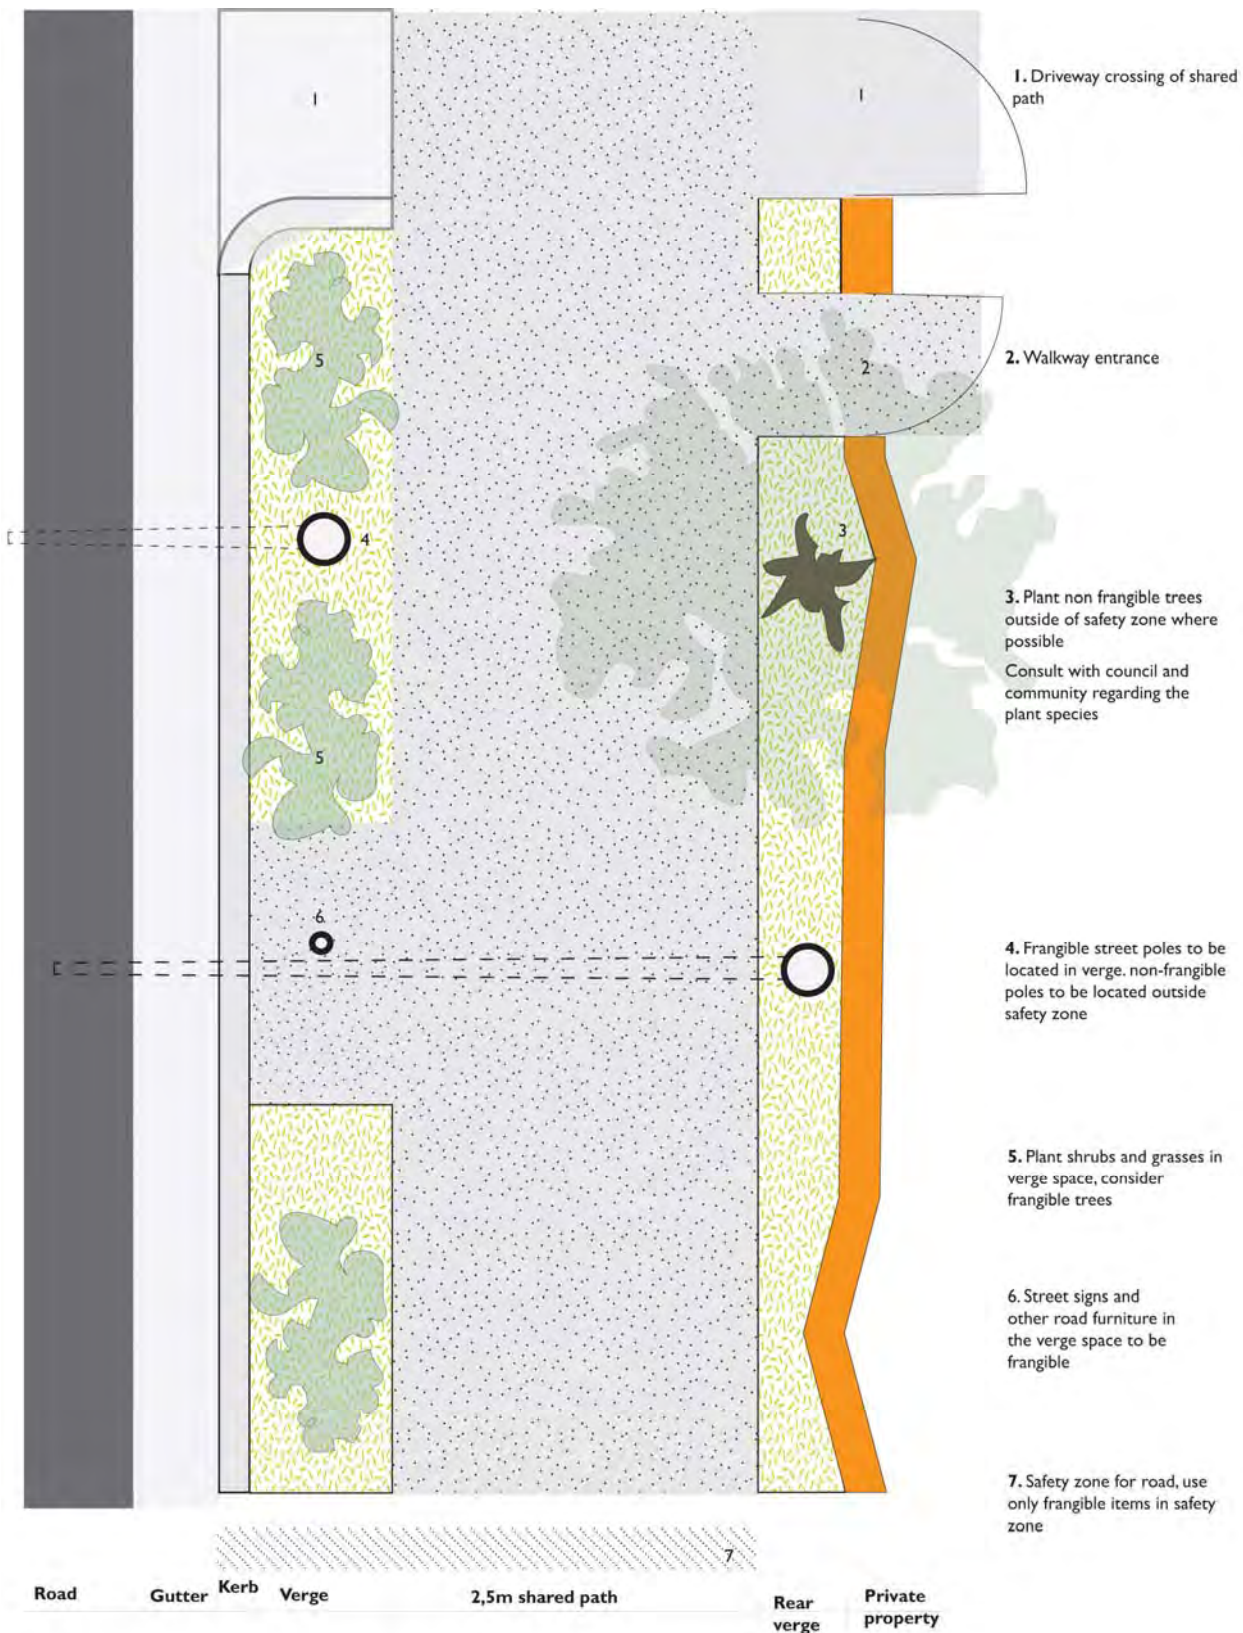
Typical layout for shared path along Botany Road and Wentworth Avenue
